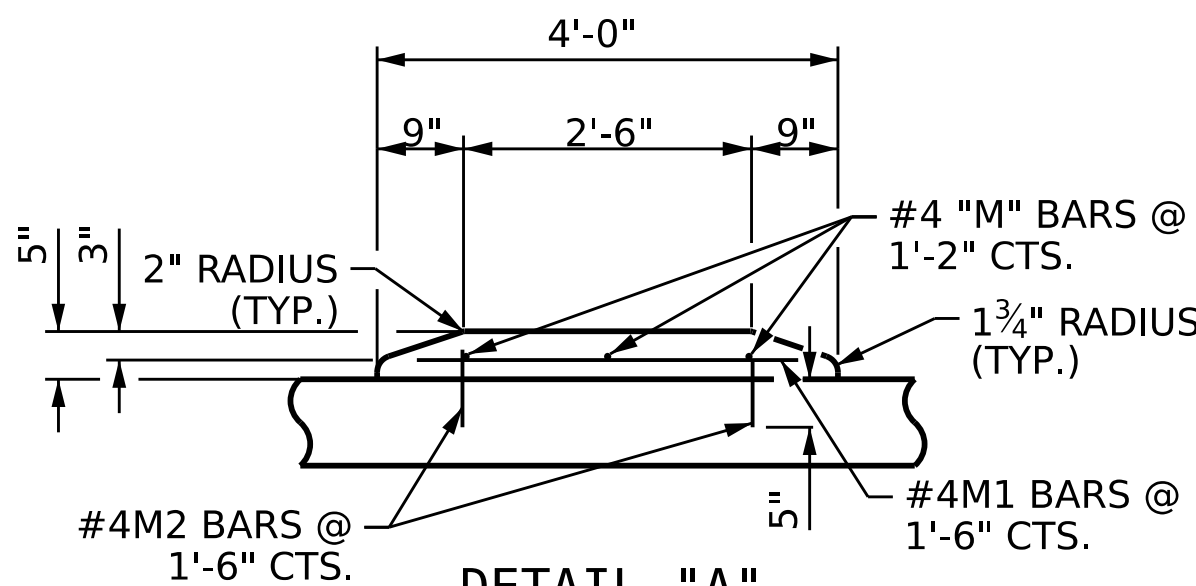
DETAIL FOR POLYMER CONCRETE OVERLAY
